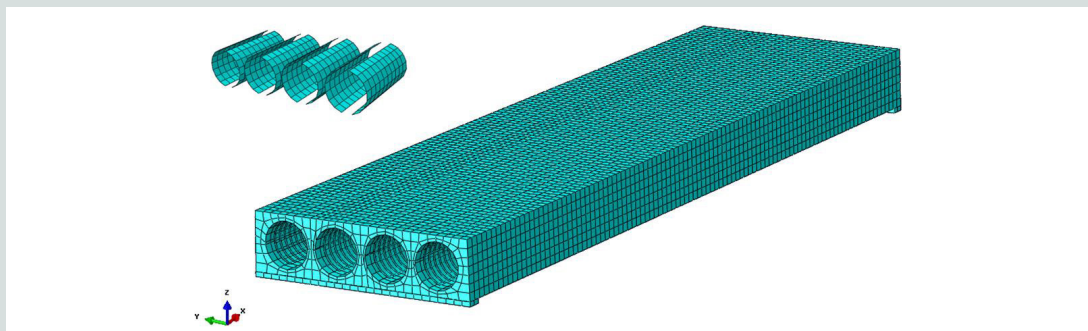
Three-dimensional view of the prestressed concrete hollow-core slab finite element model.
